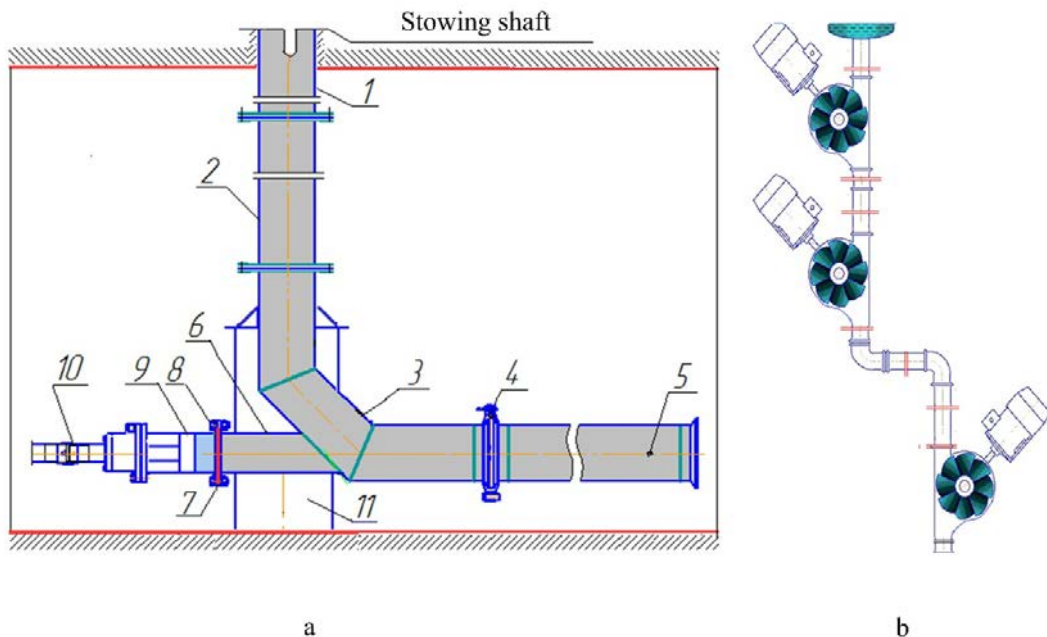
Stowing pipeline design (a): 1- surface pipe; 2-vertical insertion piece; 3-welded knee joint with 90° bend; 4-make-and-break joint; 5-horizontal pipeline; 6-connecting pipe; 7-diaphragm; 8-flange coupling; 9-hydraulic cylinder with a piston; 10-a fixed joint of the piston rod with the vibration source; 11-seating unit; (b) – installation diagram of hydraulic turbines on the stowing pipe.
